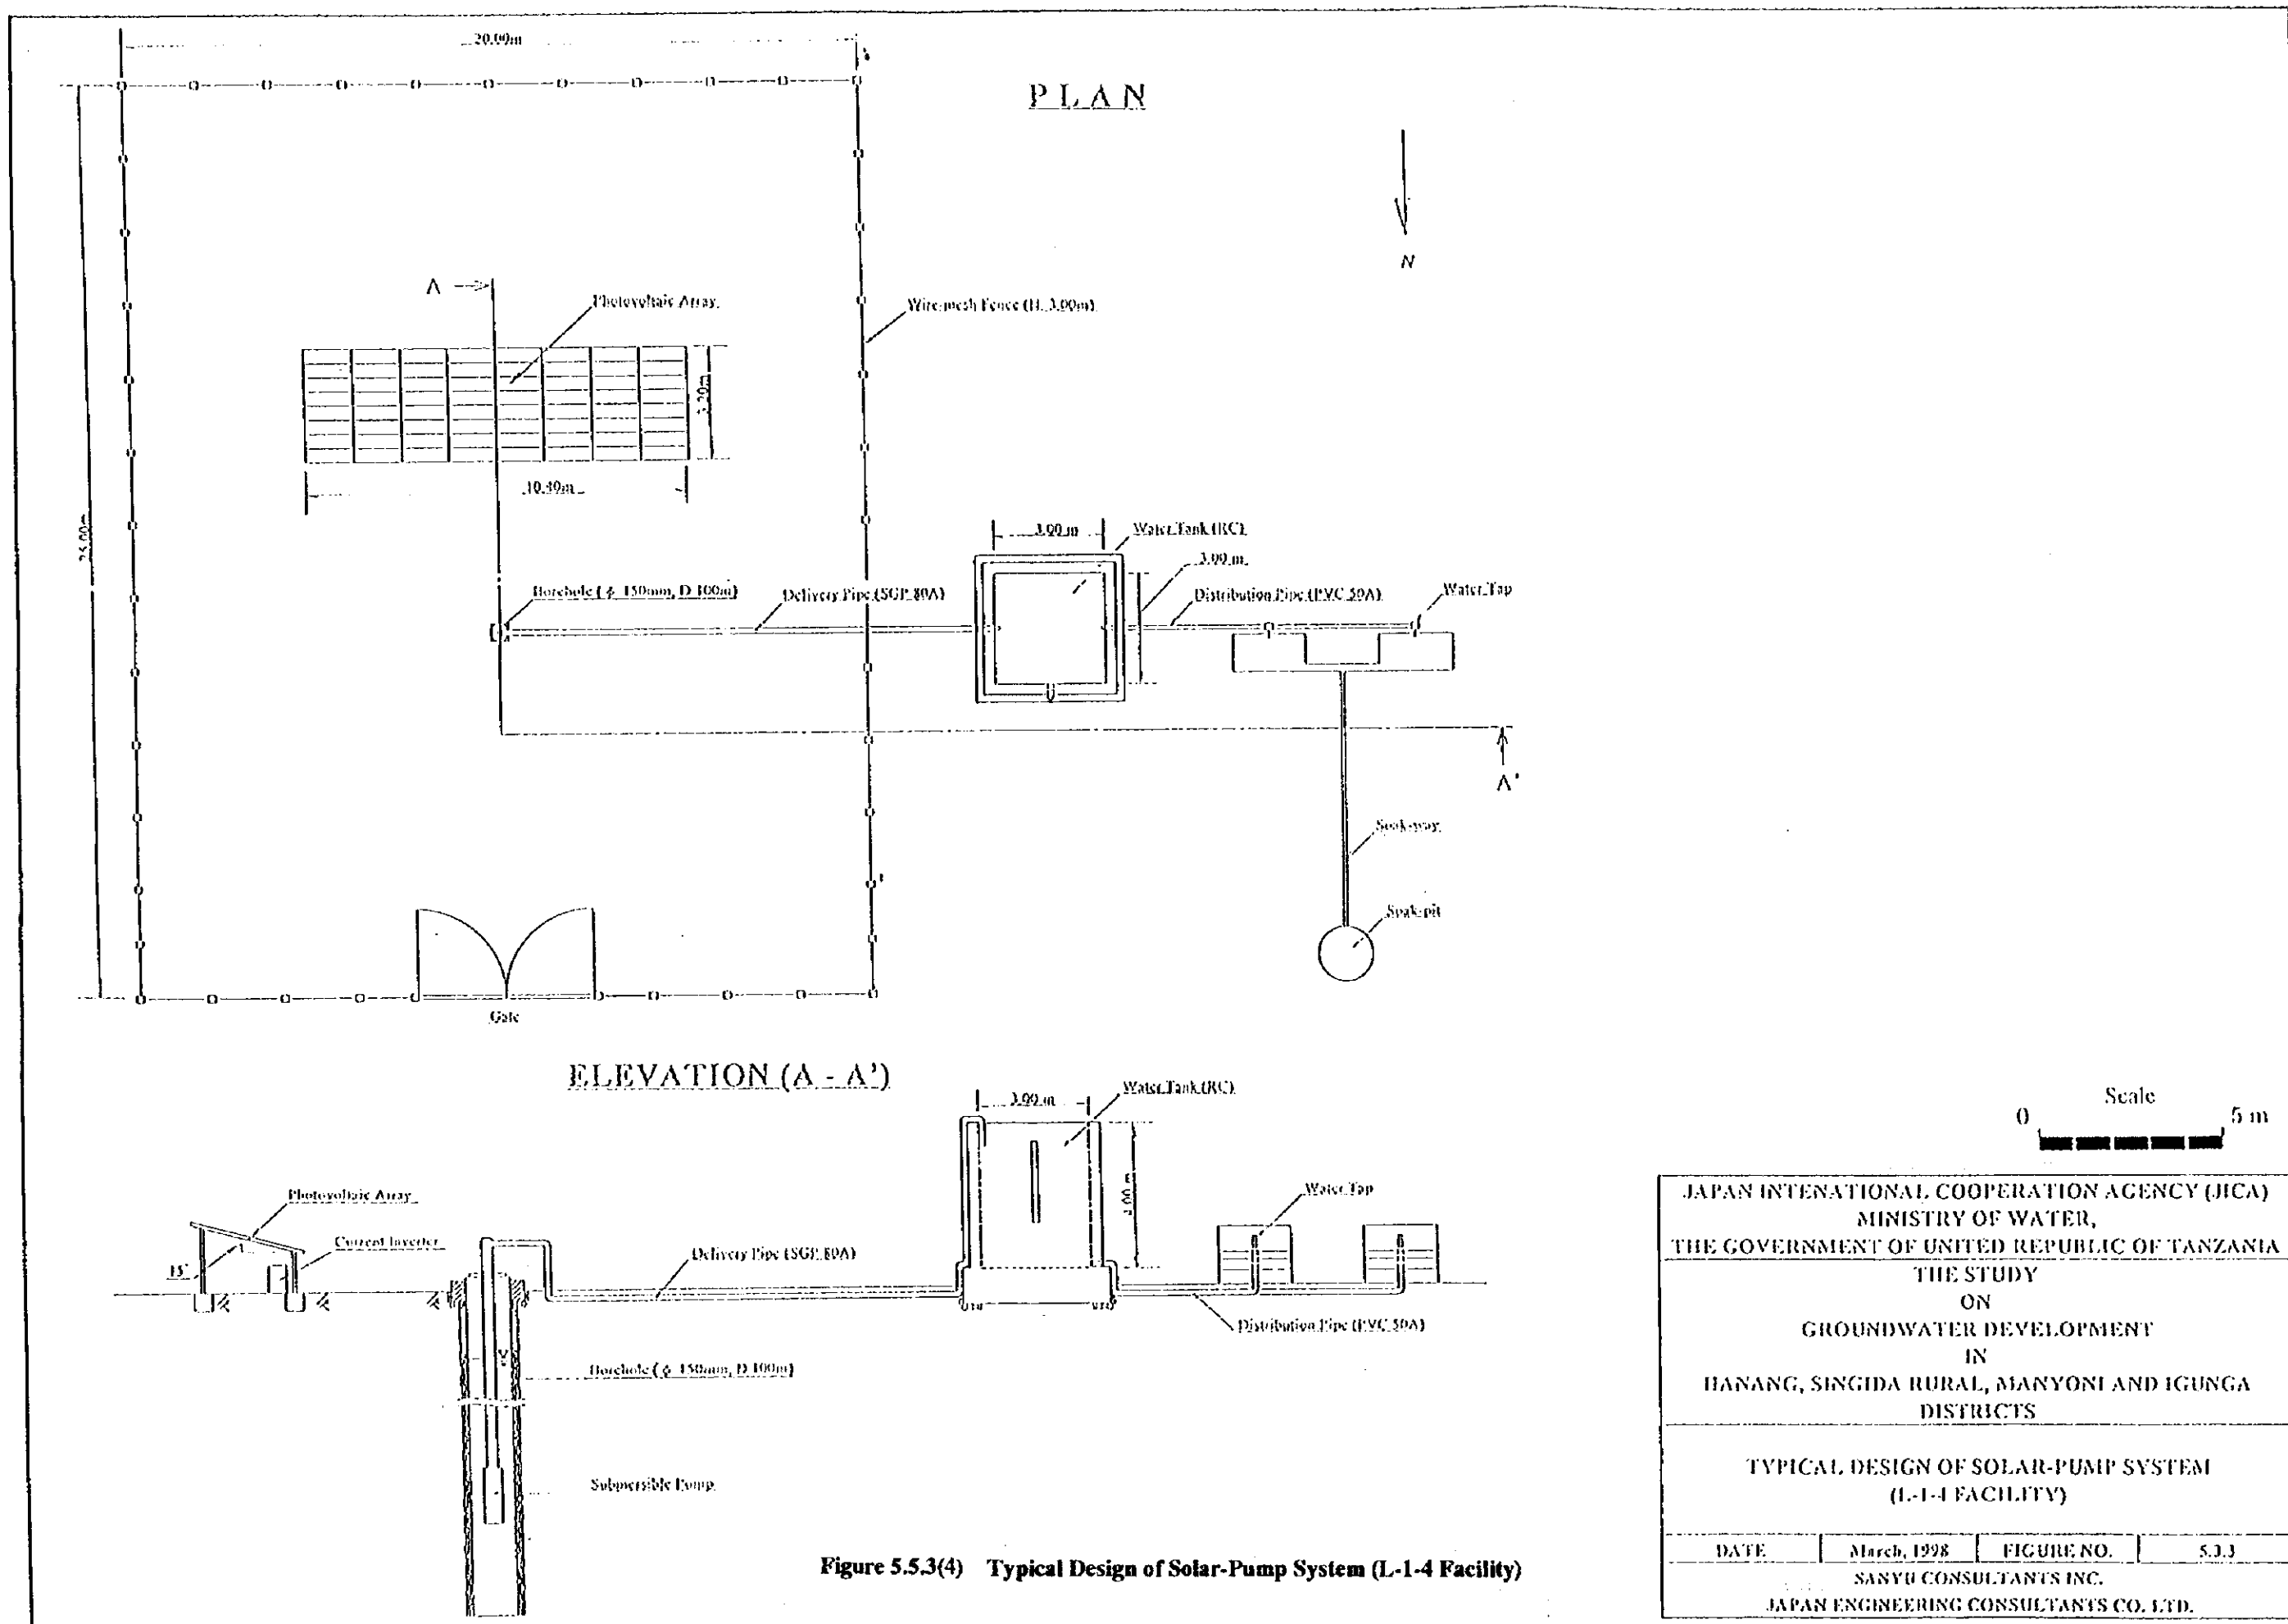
(4) Typical Design of Solar-Pump System (L-1-4 Facility)
